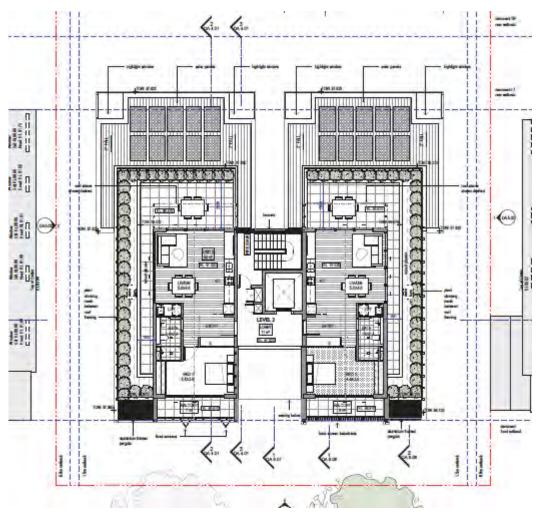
Original lodgement of Level 2 floor plan - DA-88/2019
